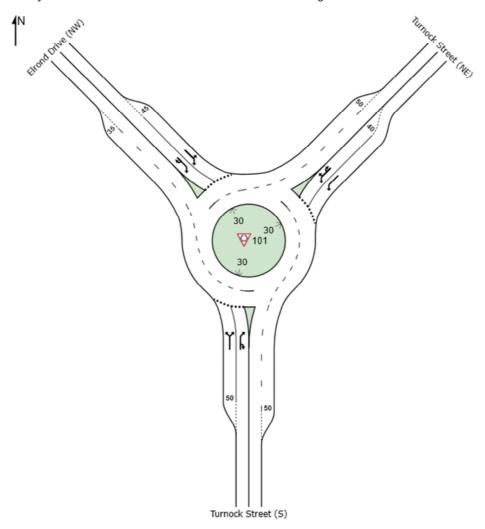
Turnock Street / Elrond Drive SIDRA Intersection Layout
